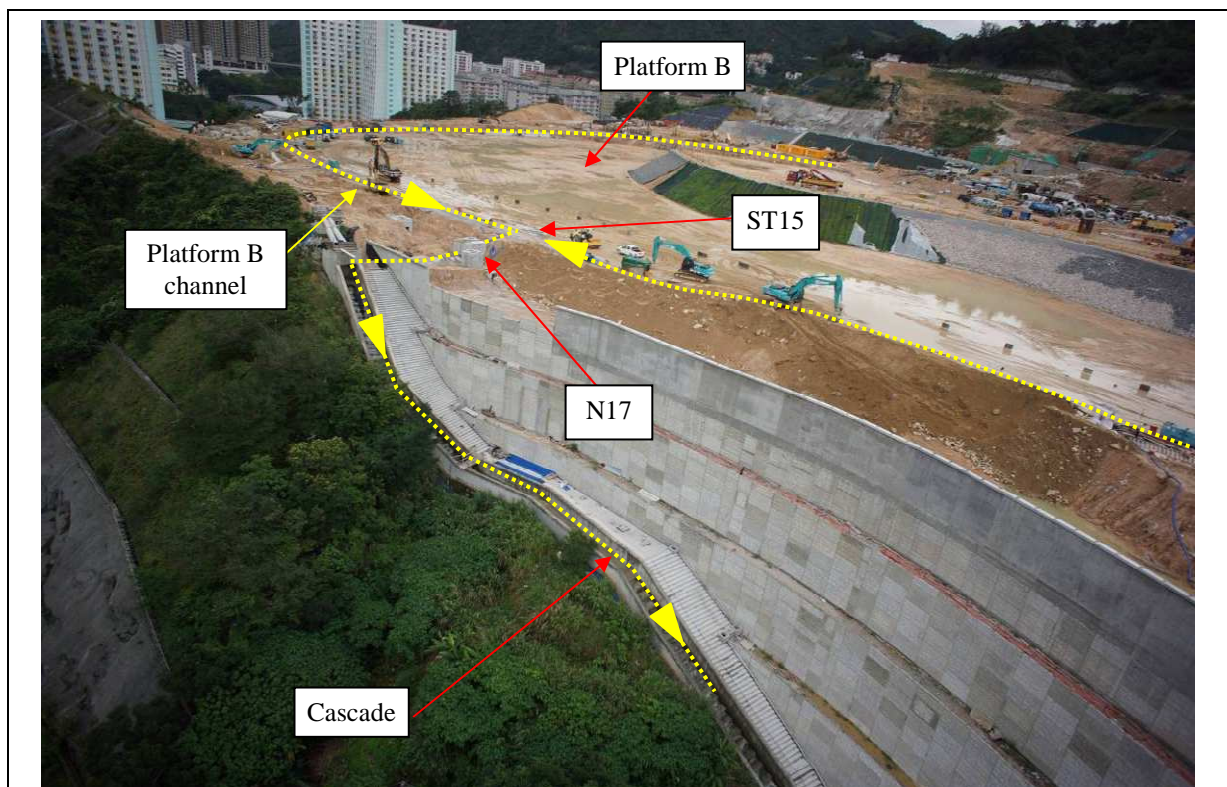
Drainage Outlet at Cascade in front of Wall R26 (Photograph taken on 23 May 2013)
